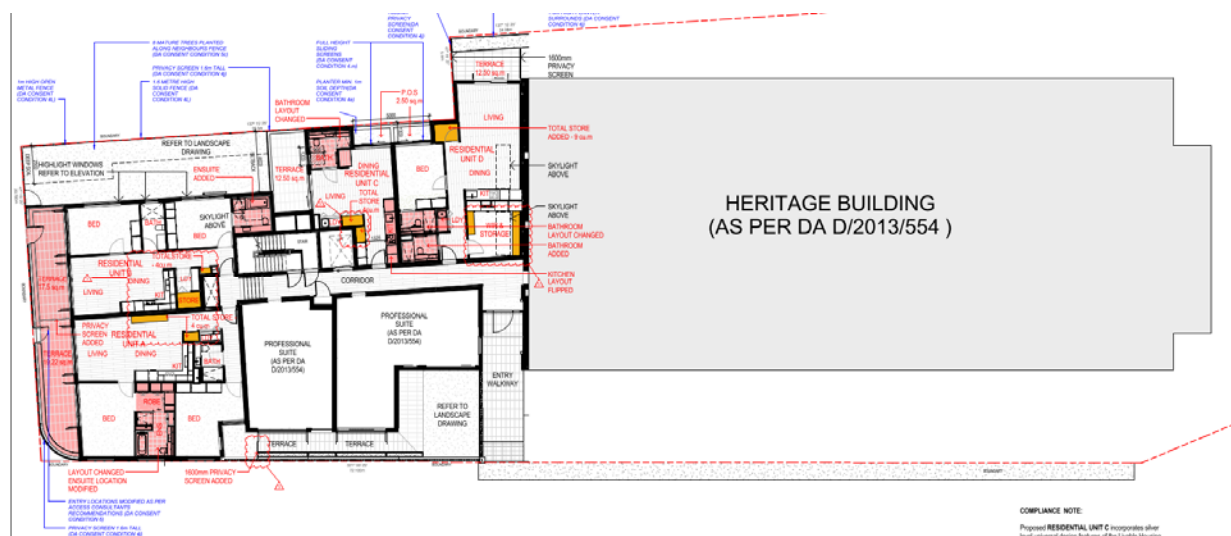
Approved ground floor under D/2017/133 at 100-104 Reynolds Street.
